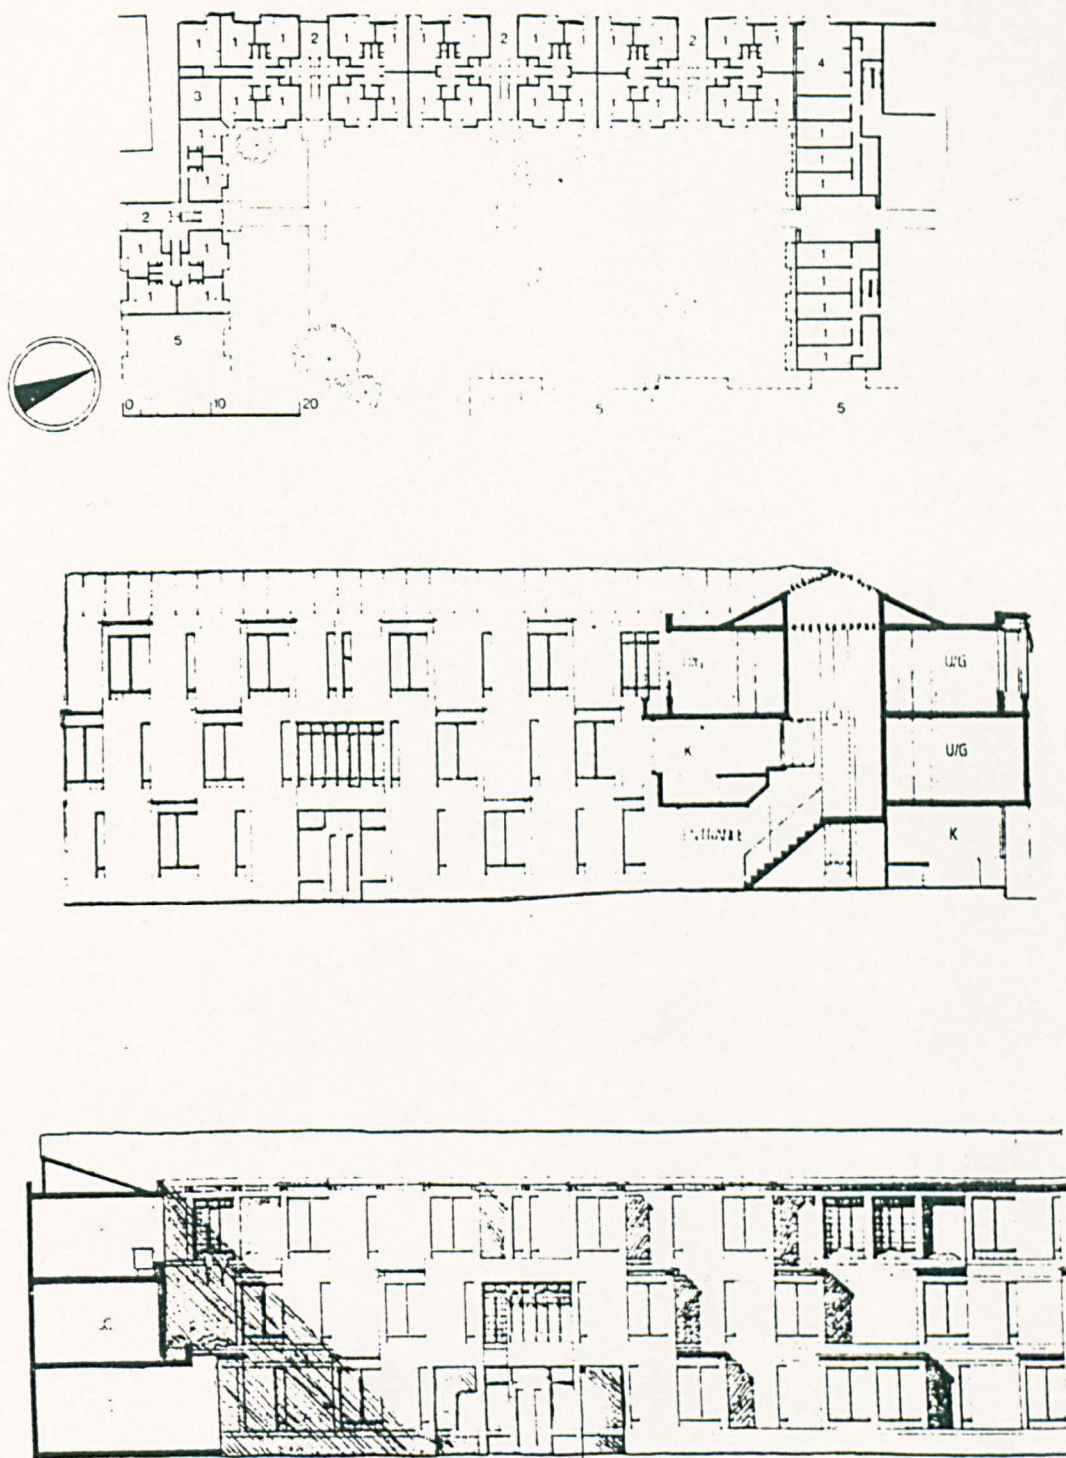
MacCormac, Jamieson and Prichard, Fitzwilliam College, Cambridge. Above, plan. Middle, section through stair. Below, early facade studies. The rooms are clustered around shared spaces, with a staircase hall which is a double-height top-lit space. Soanian effects are achieved with a glass frieze [A.J. 30 May 1984 p.20]
